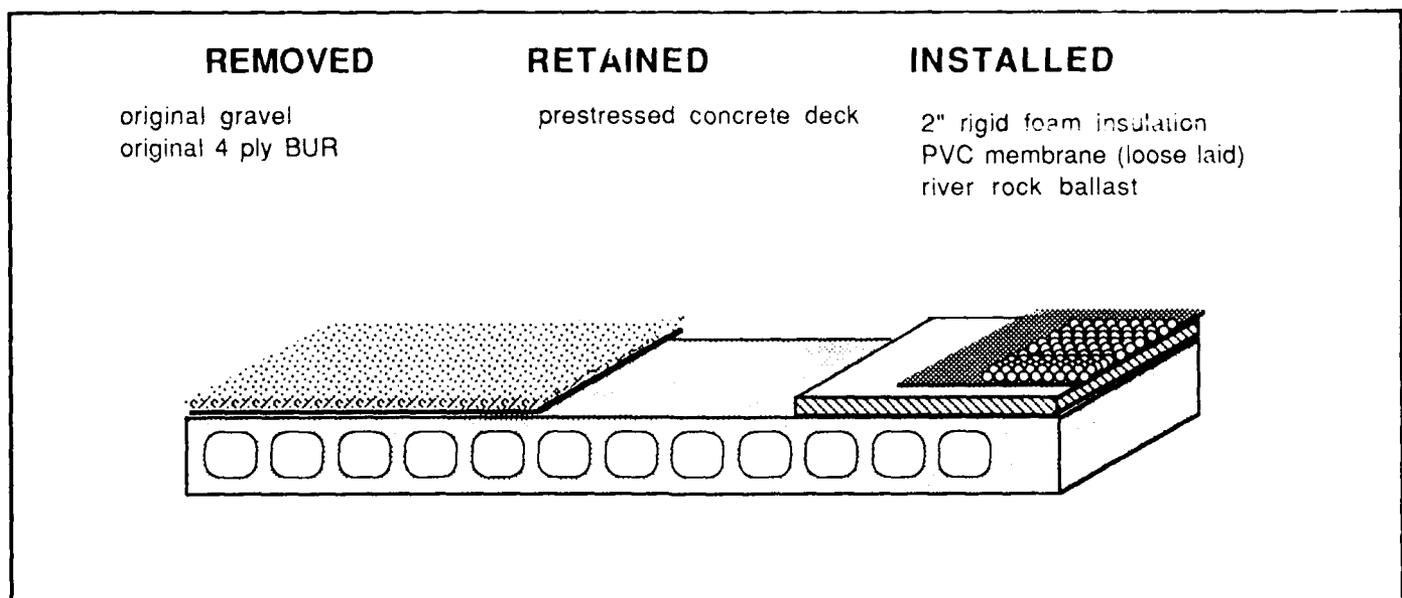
Schematic of a ballasted PVC membrane installed over a prestressed concrete deck.
